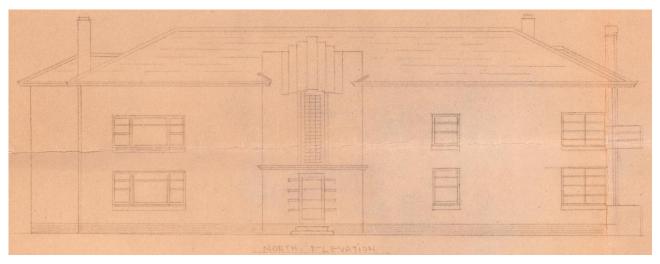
Original drawing, north side elevation of 58A Westbury Street. (Source: Council building file)
